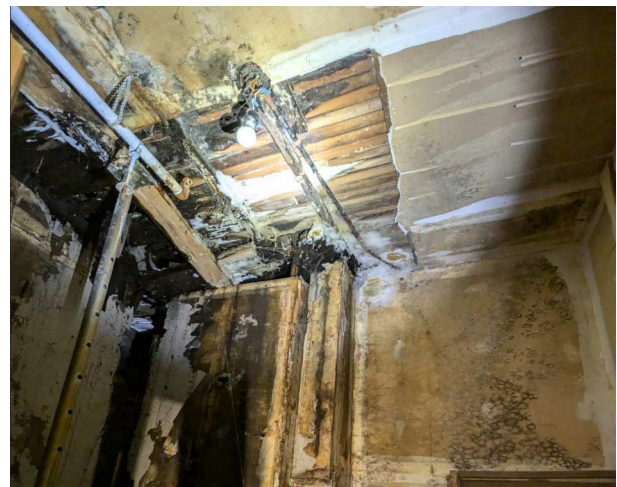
, Previously installed steel shoring post to support rotten collapsing floor.
